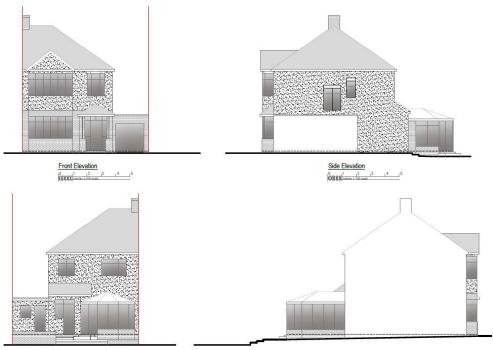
Existing rear elevation of the application site and its relationship with No. 45 Fairfield Avenue.
